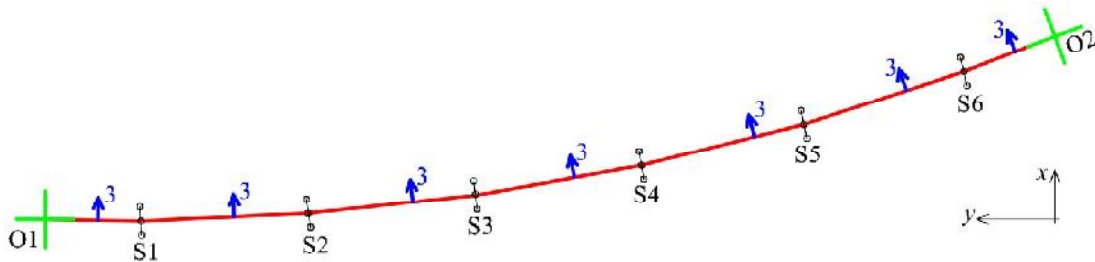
Bridge plan with local axes of the piers (blue – axis 3, green - abutments)
